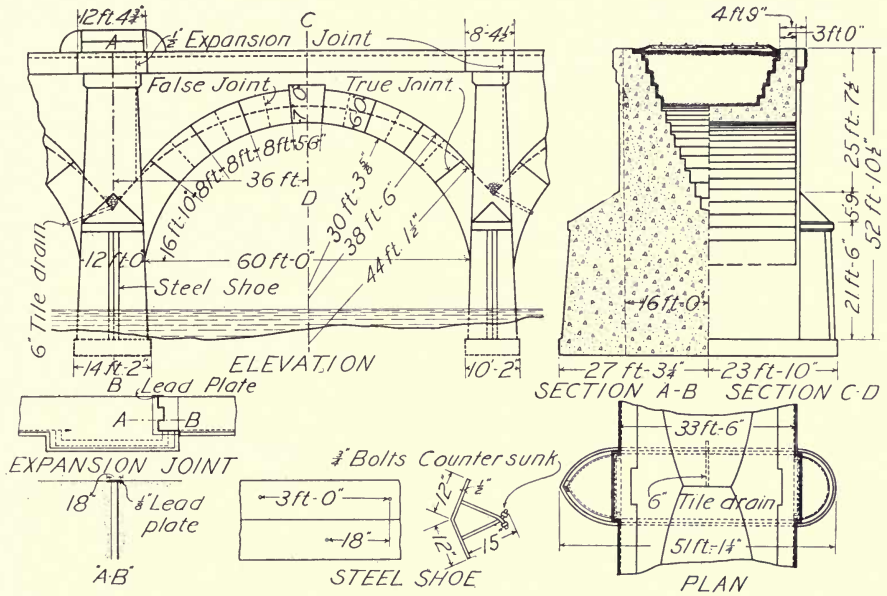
DETAILS OF 60-FT. ARCH, WALLKILL RIVER VIADUCT.
